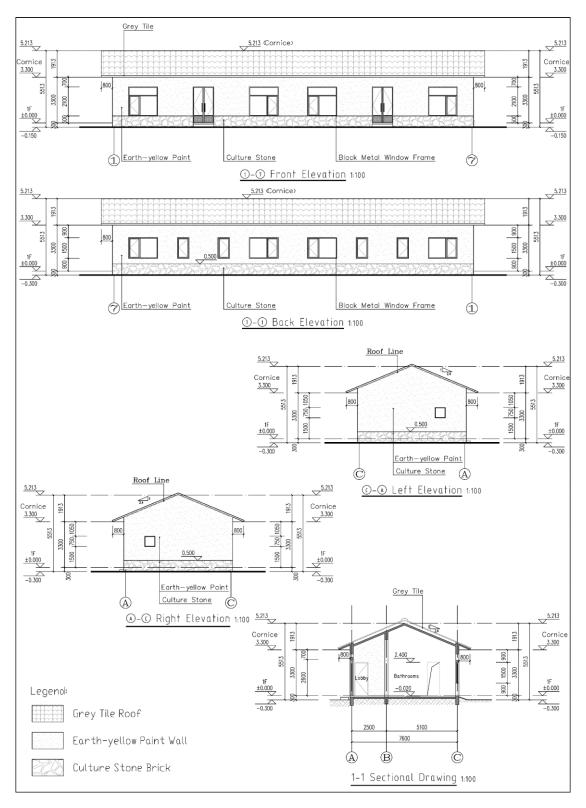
Four Elevations and Sectional Drawing of Sample Guest Room No. 2 (Drawn by the author)
